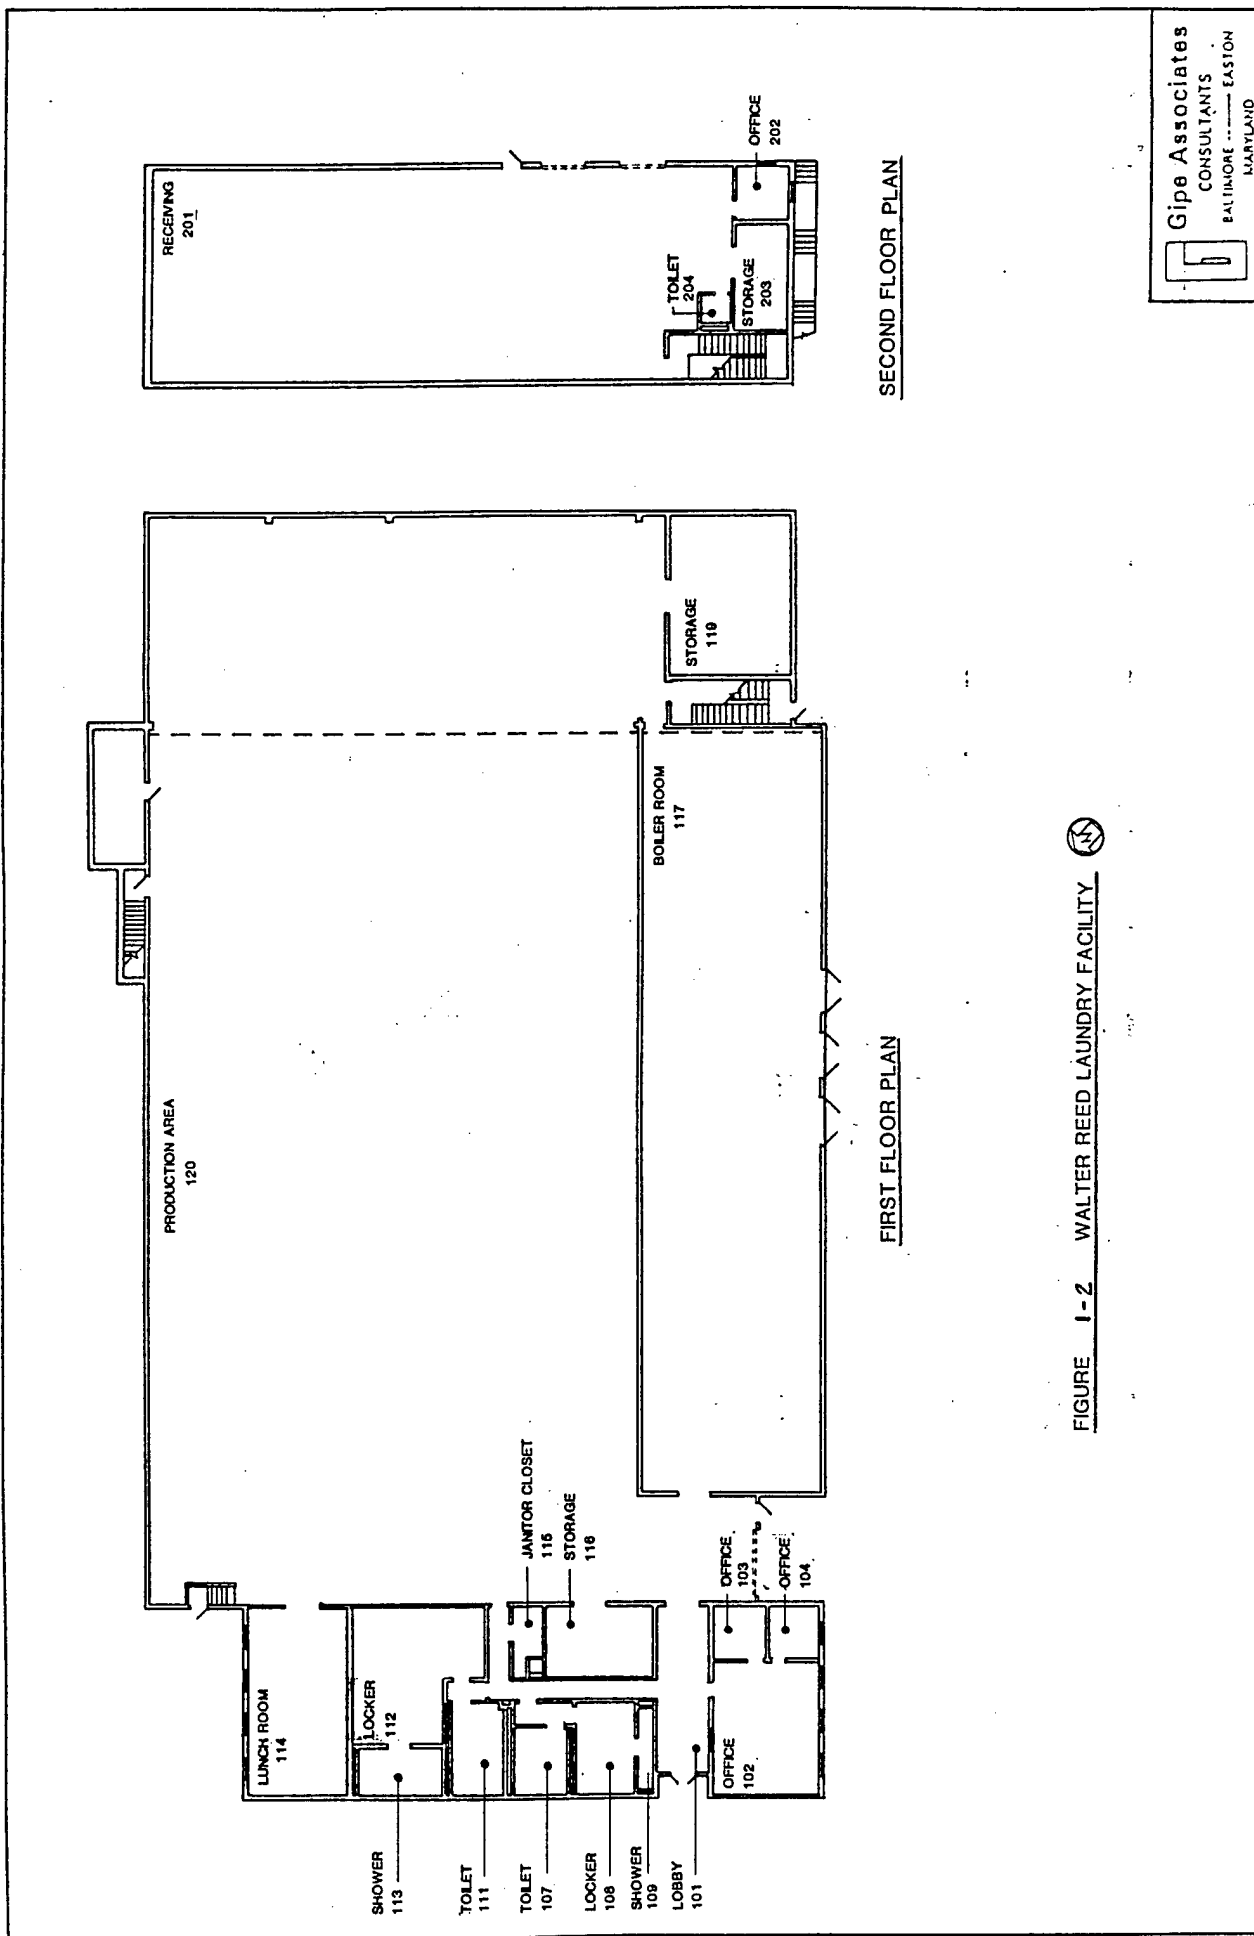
WALTER REED LAUNDRY FACILITY
